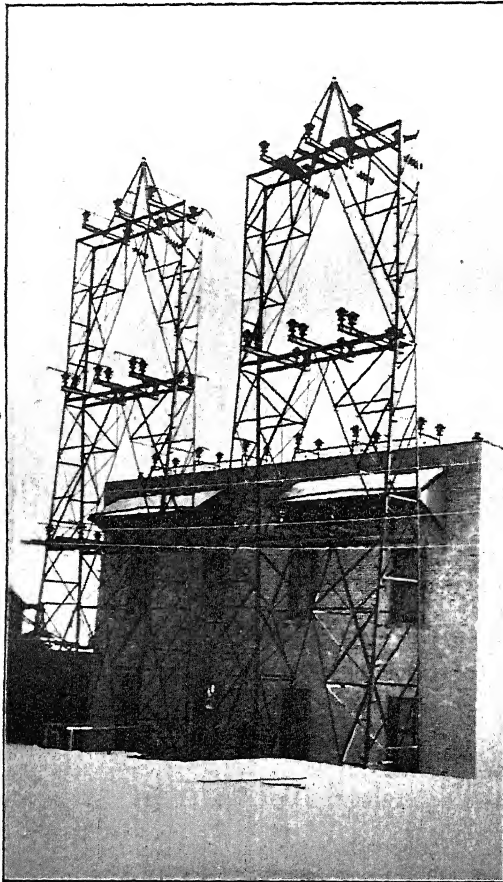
TOWERS AT IRON RIVER SUBSTATION.
